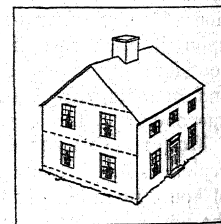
DIAGRAM SHOWING RIDGE ON CENTRE, RAFTERS STARTING BELOW SECOND STOREY CEILING
